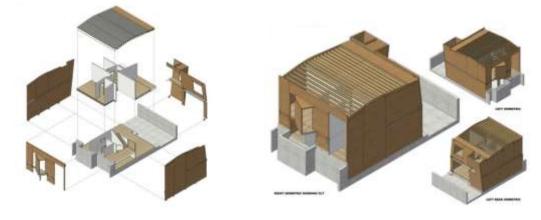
Exploded view of CLT structure showing Primary Load Bearing PLB objects
